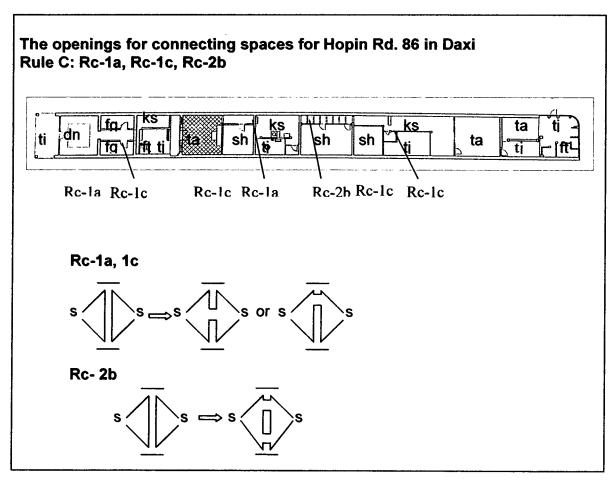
23 Rule C for illustrating the openings on inner walls of floor plans at Hopin Road 86 in Daxi
